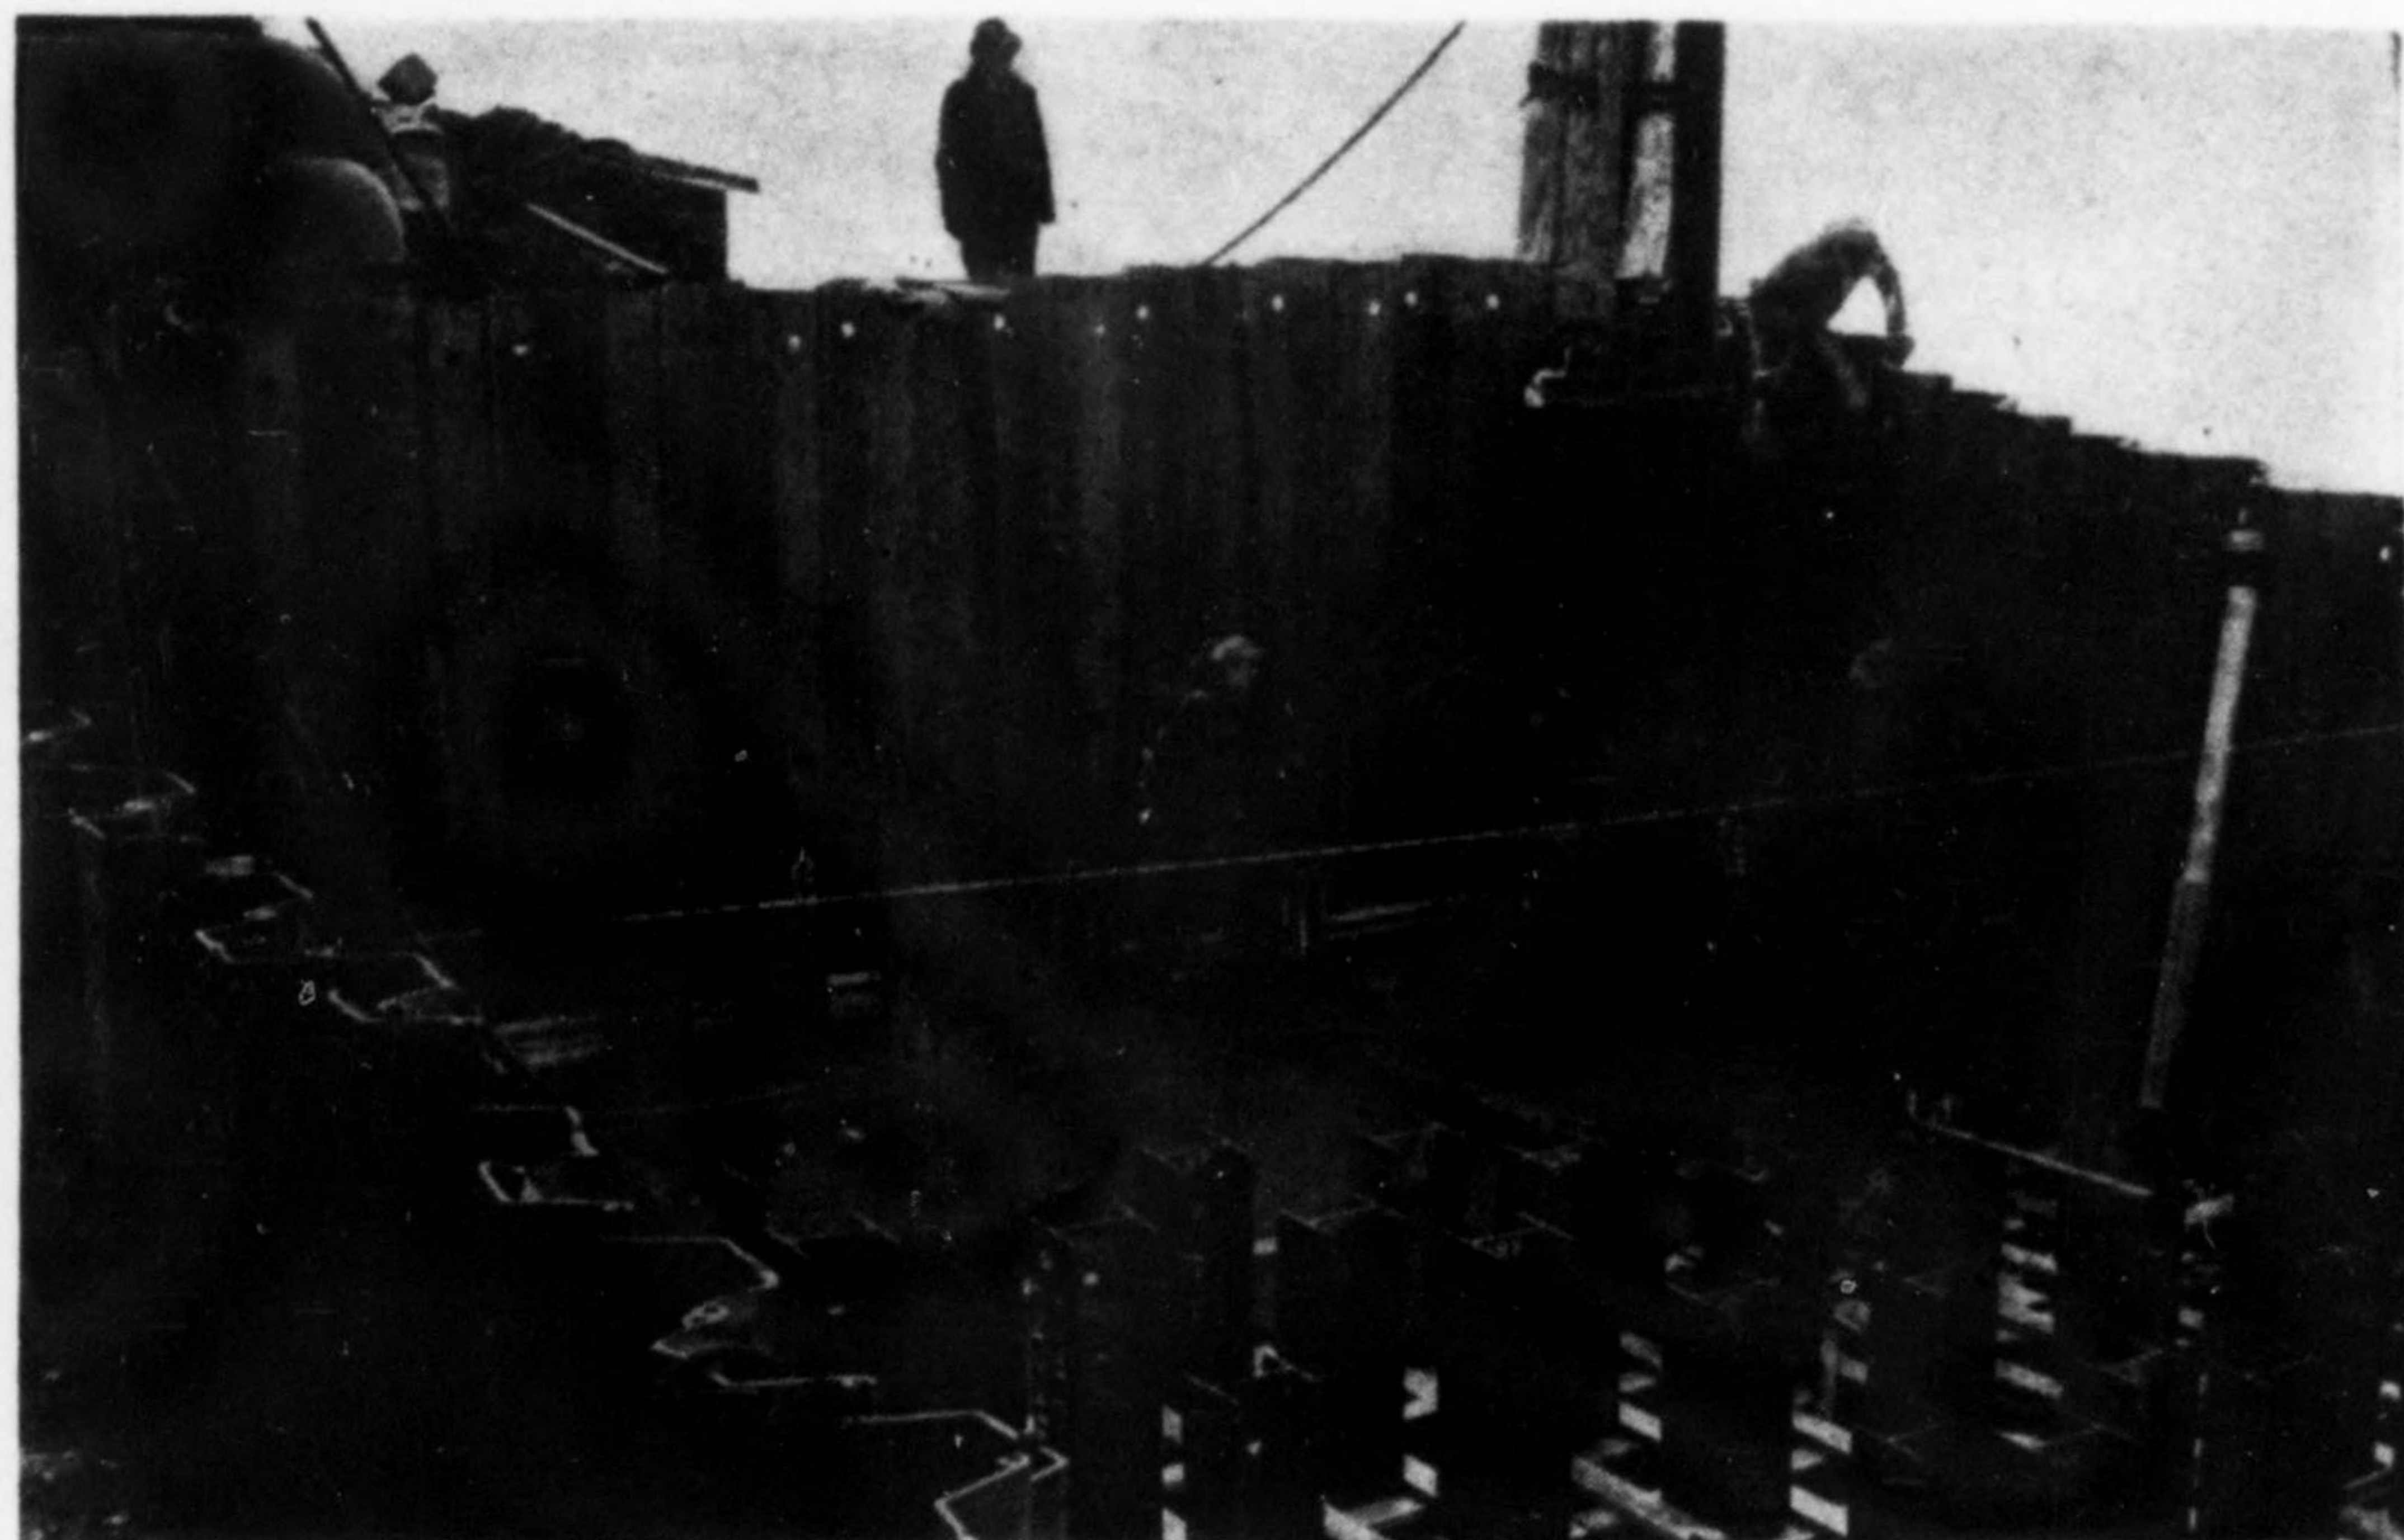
Pile driving operations, underway for Pier 12, which will have a spread footing. Piles at left have been driven to bearing.
